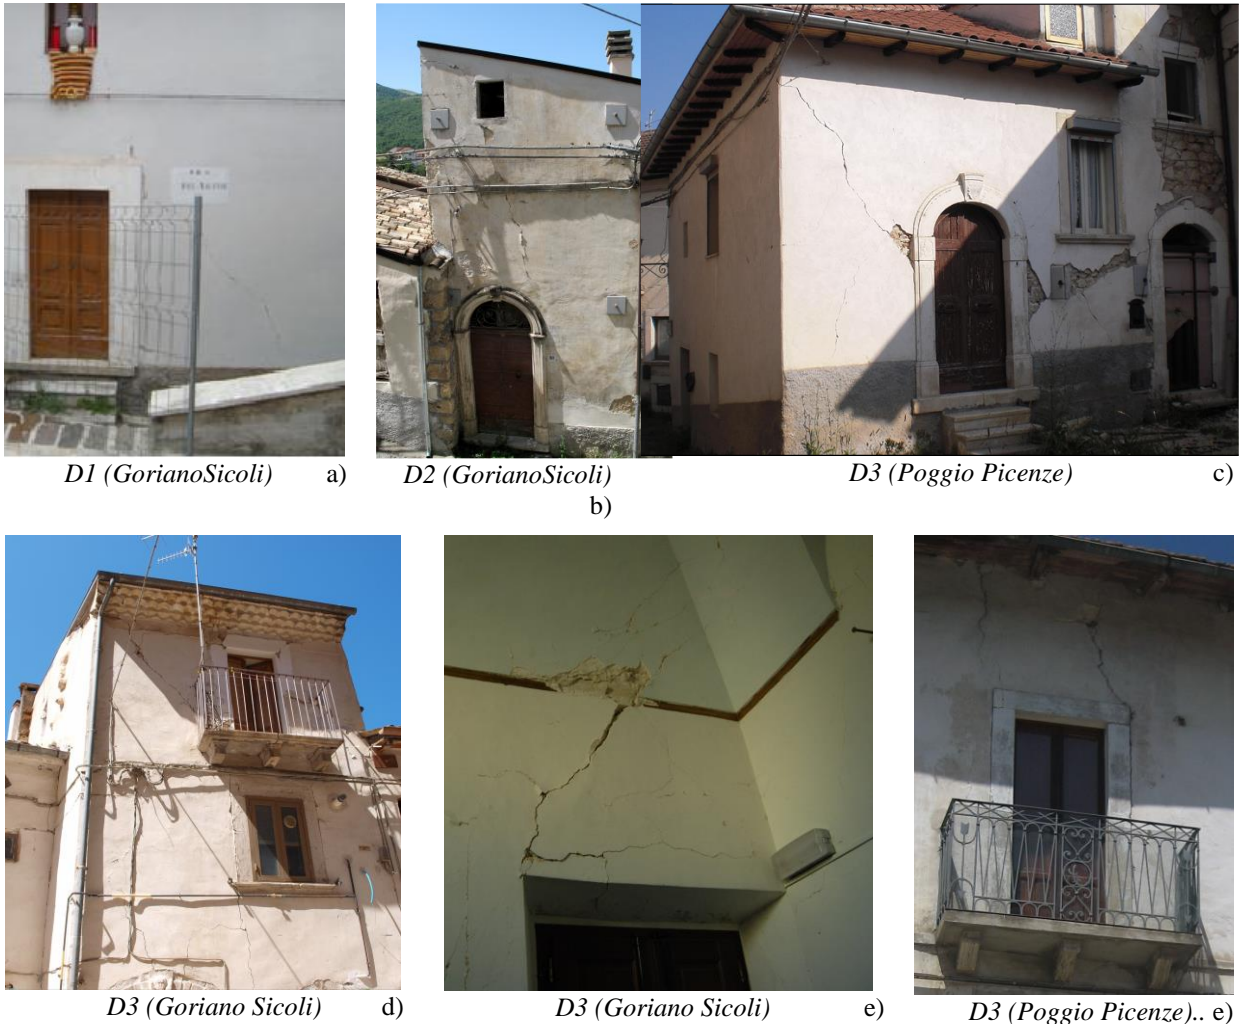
Diagonal shear cracks on masonry walls associated to damage levels of (a) D_1 , (b) D_2 and (c) D_3 ; D_3 damage level observed in (d) walls with low axial forces and (e) spandrels.
